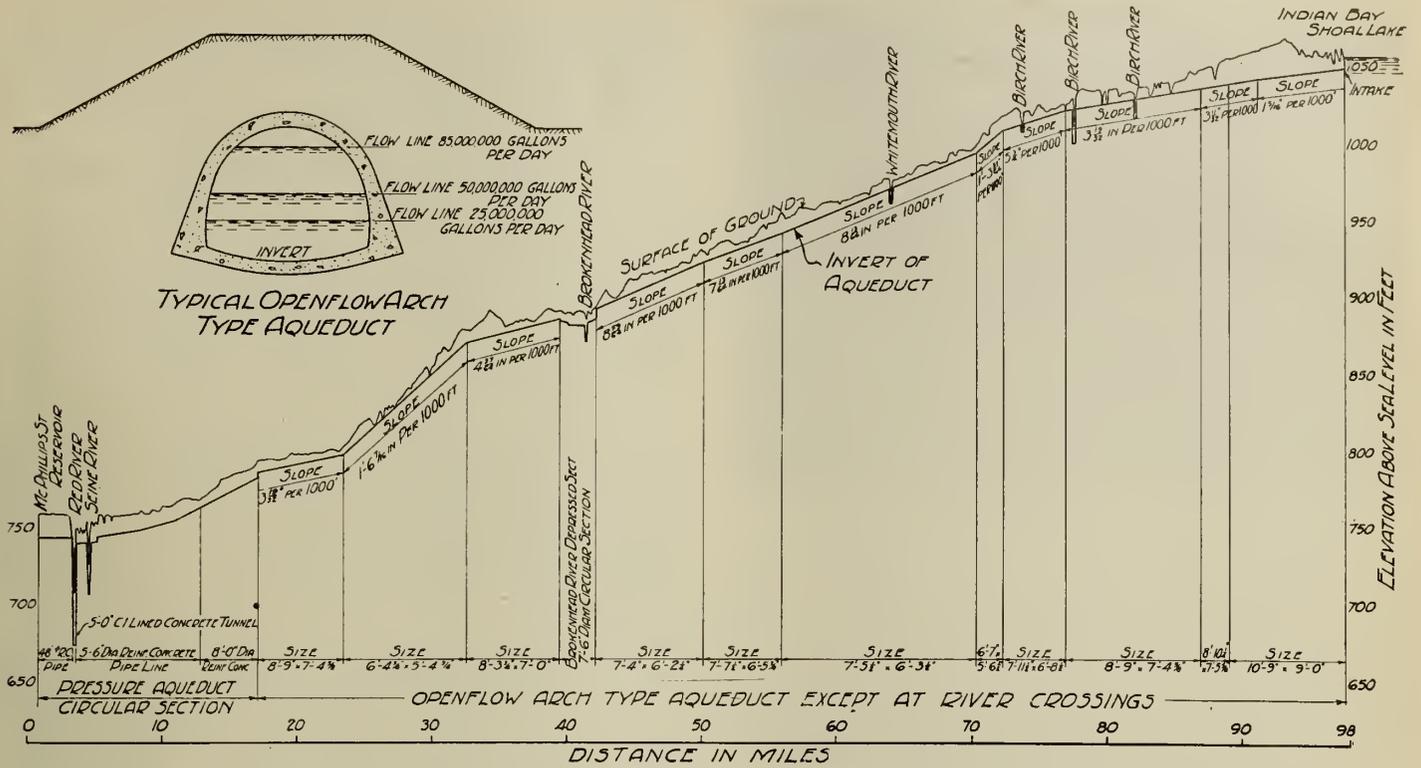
Profile of Aqueduct with Cross-section of Openflow Arch Type Section.
